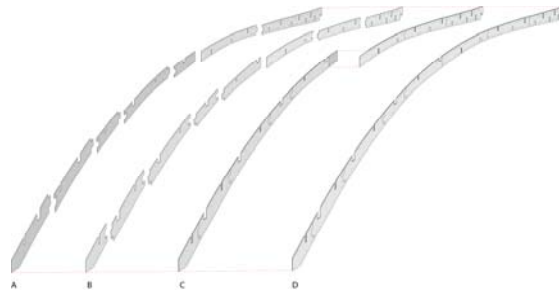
Drawing showing the assembly process of a typical rib, showing two staggered layers (A, B) forming a primary and secondary segment (C), then a completed rib (D).
